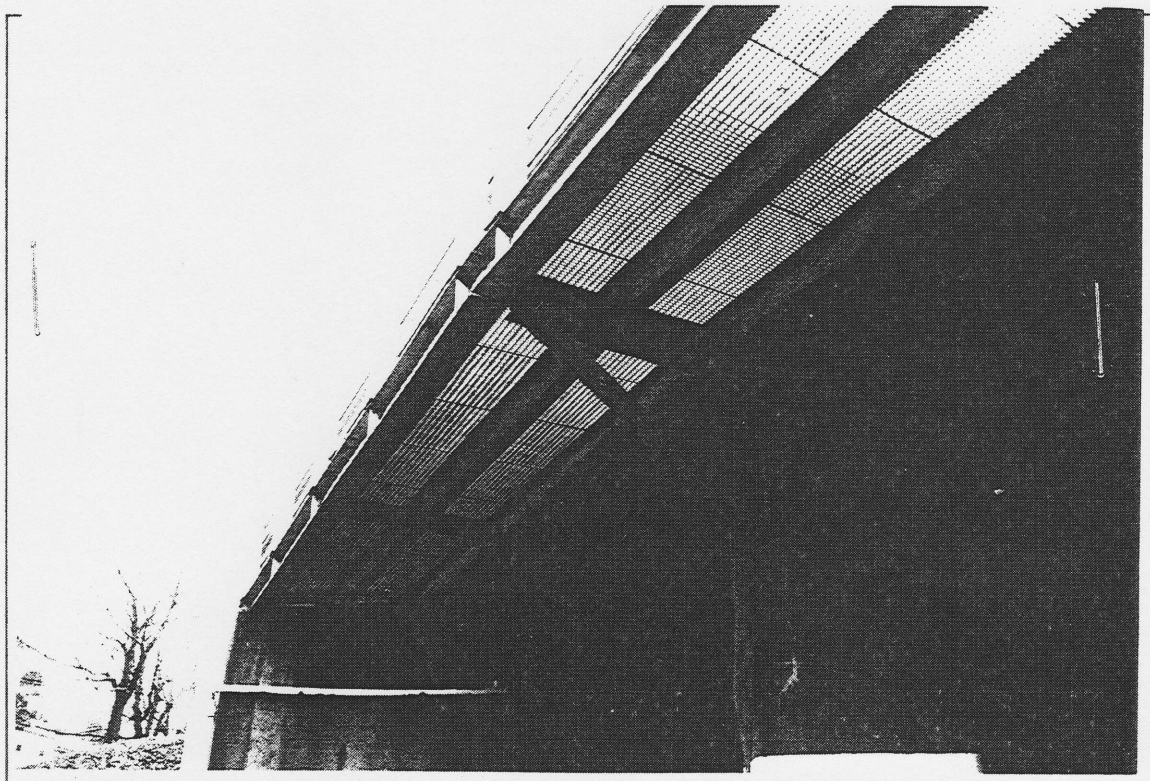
Portsmouth Approach Detail of Sidewalk from Below
